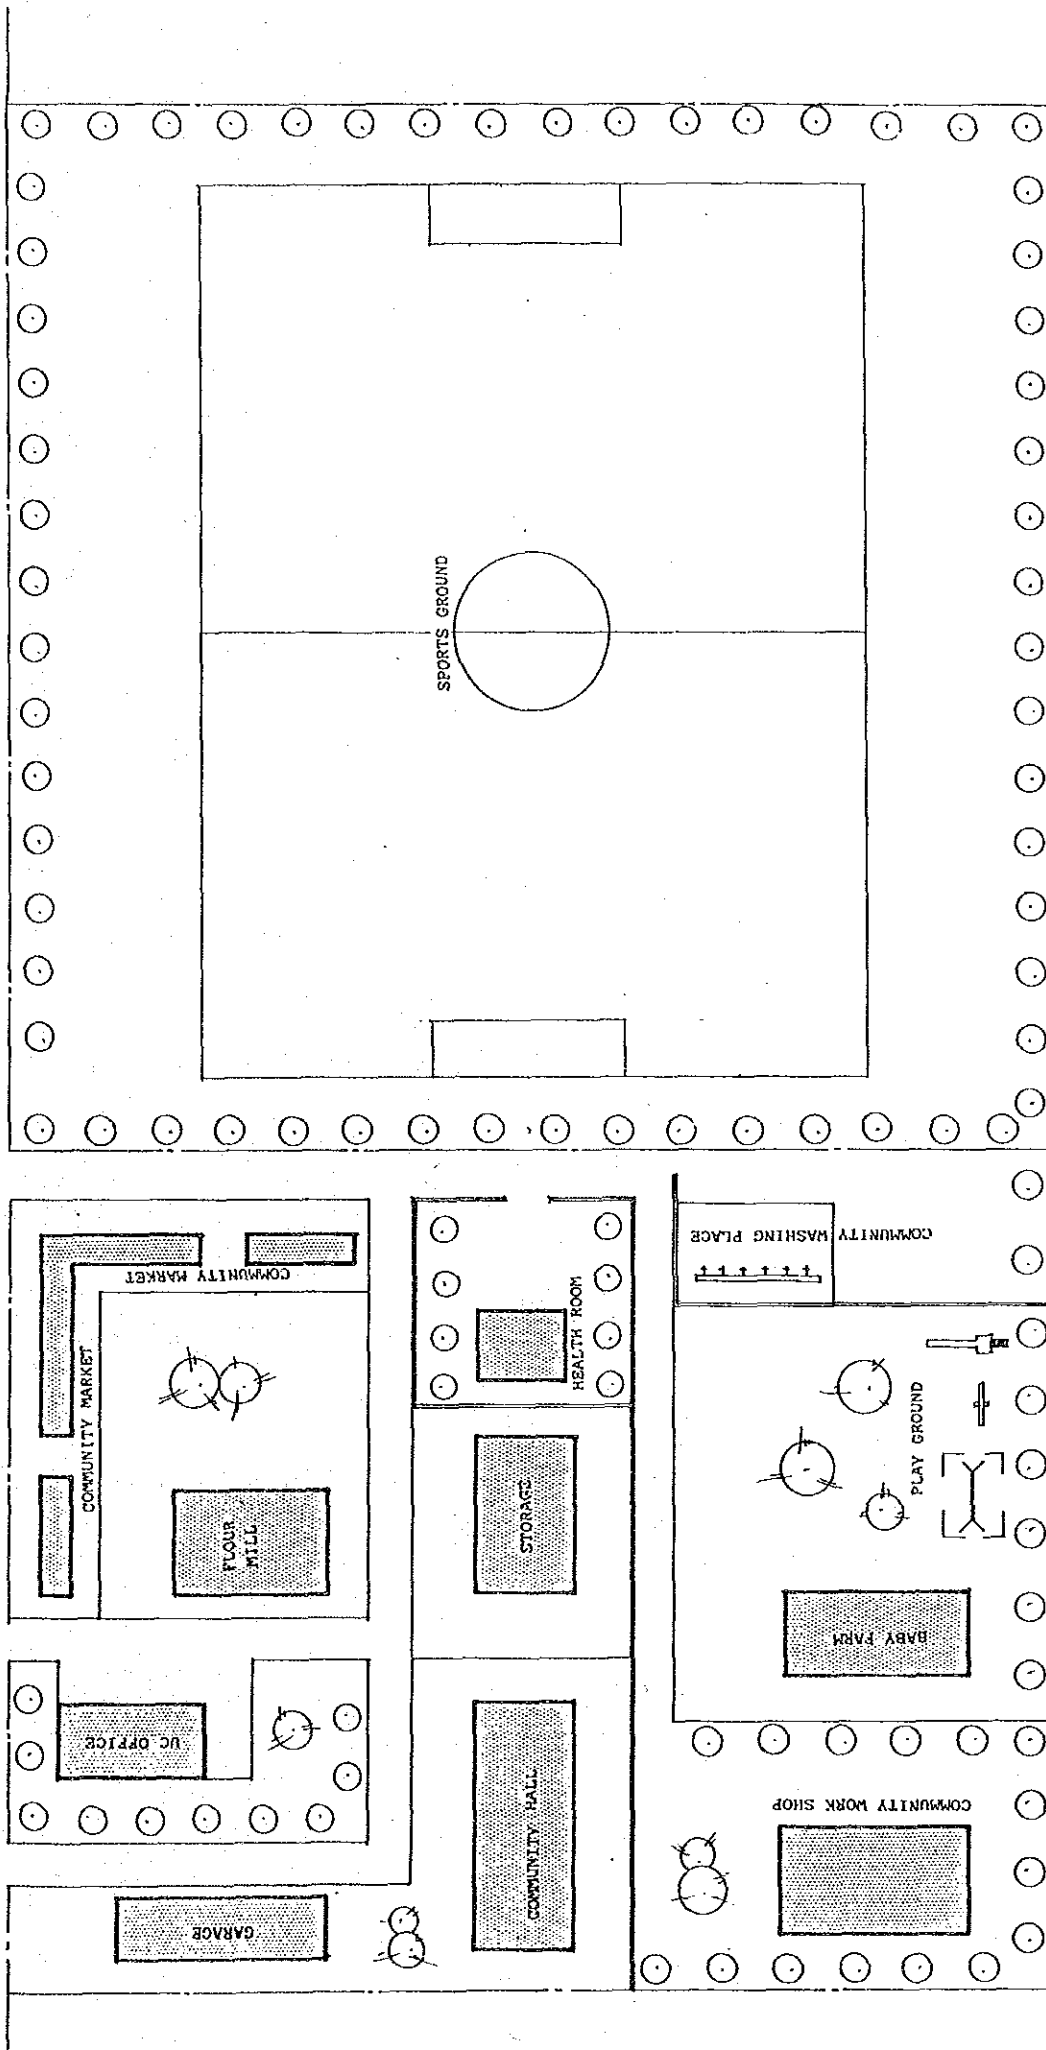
PROPOSED SITE PLAN OF RURAL DEVELOPMENT STATION
